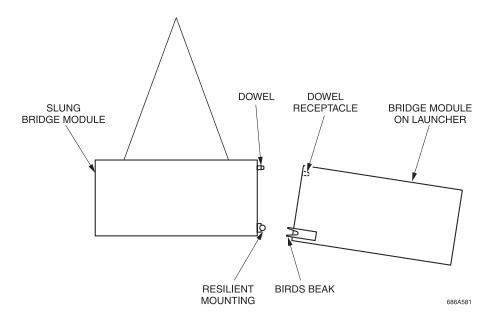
44 Sling Bridge Module and Align the Birds Beaks
